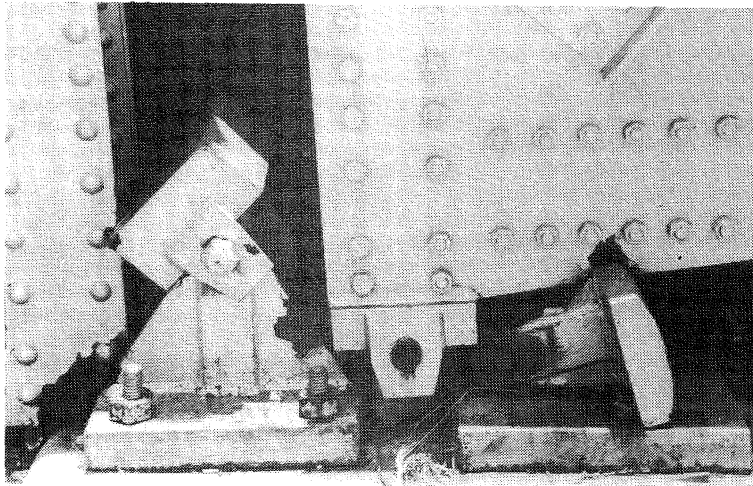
Carmen Bridge: pin and rocker bearing failure at the pier between spans 1 & 2. Refer Figure C6.1. There was no longitudinal tie between the girder spans
